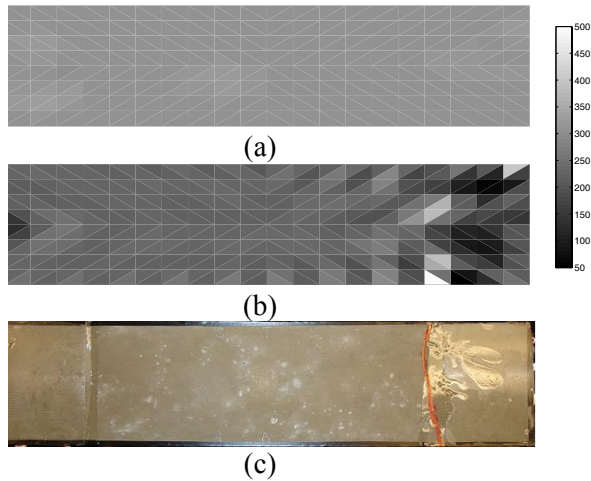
EIT images of Specimen #4: (a) prior to loading, and (b) after damage localization. (c) Damage denoted by red marking.
